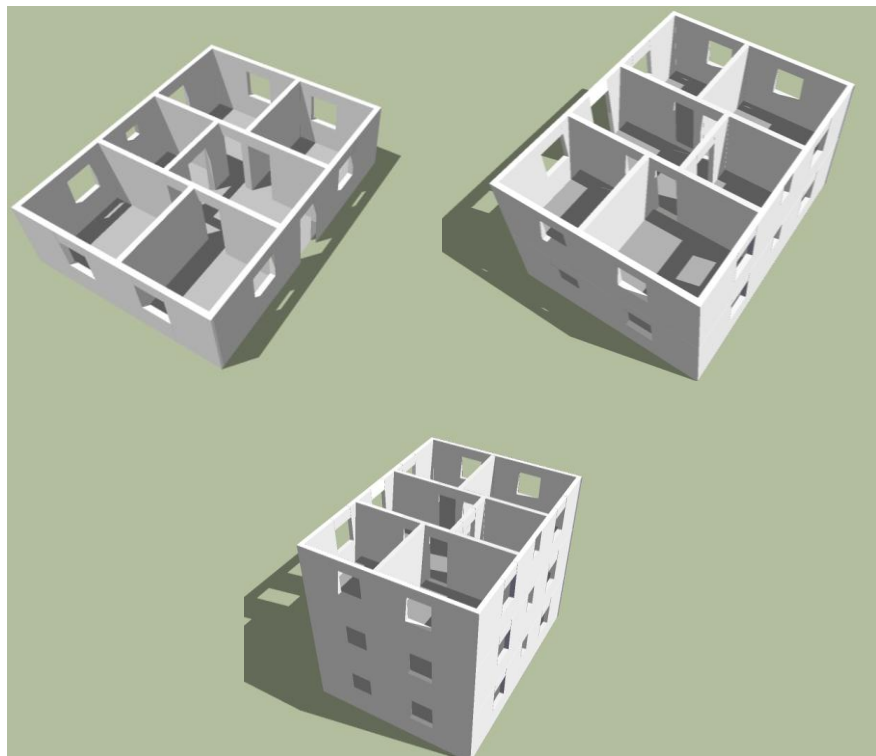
2. Duplication of R1-W1 story plan in order to construct D2 and D3 sub-classes from D1 sub-class.
